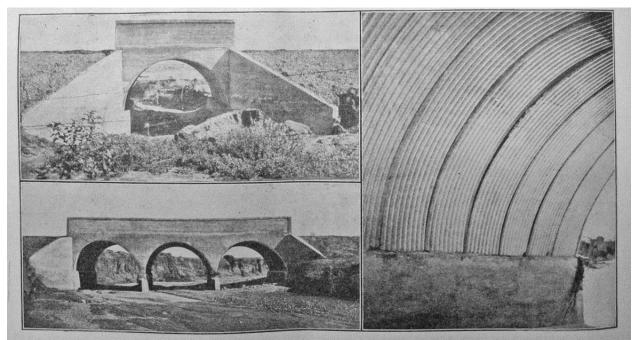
Corrugated steel culvert used for arch bridge construction of up to 12 feet span on Arizona roads in 1916. (*Engineering News*, August 17, 1916, p. 330).
